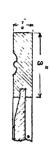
Part Vertical Section of Bedroom Lavatory Door.
